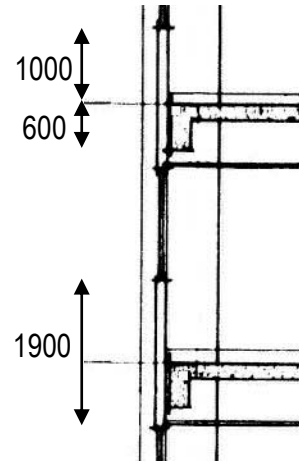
Section through facade (Fulton Collin Boys Gilmour Trotter & Pins 1972)
